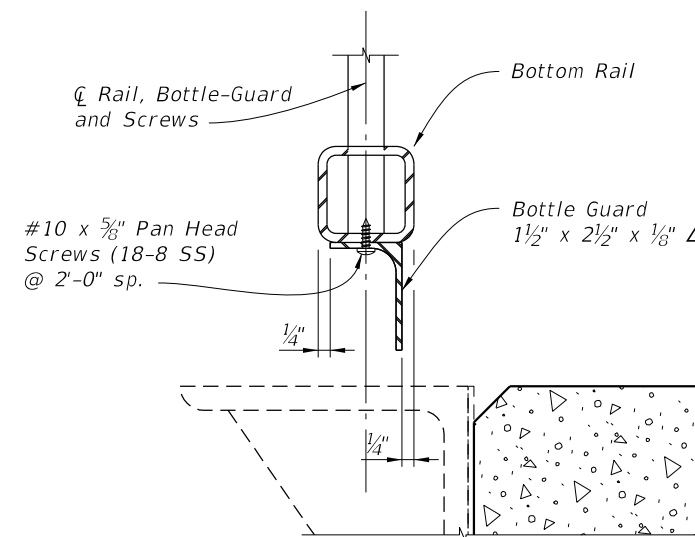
DETAIL "A" - SECTION AT INTERMEDIATE OPEN JOINT
